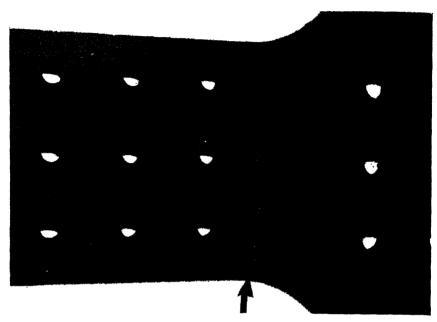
Location of Failure Occurring in Three Joints Fabricated with Bolts. (Specimen D-14)
